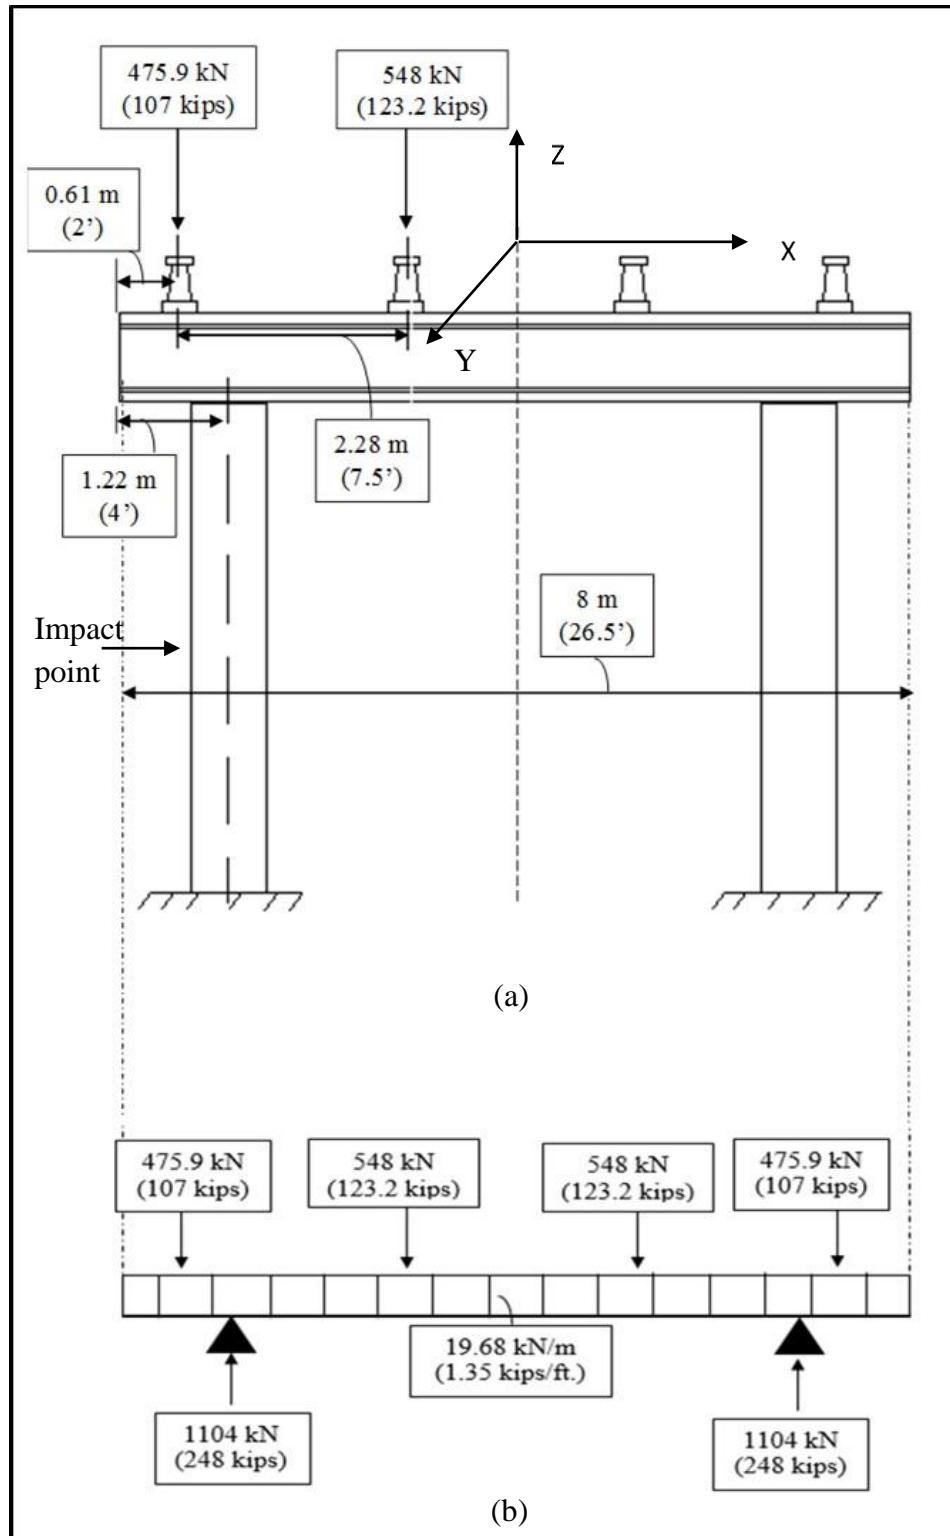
(a) Loading on the bridge pier (b) structural model used to determine the loads on the impacted pier
